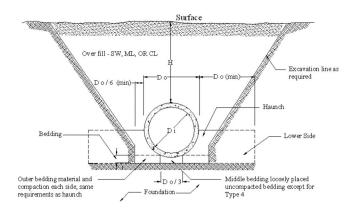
Standard trench installation [adapted with permission from *Concrete Pipe Technology Handbook* (ACPA)]
